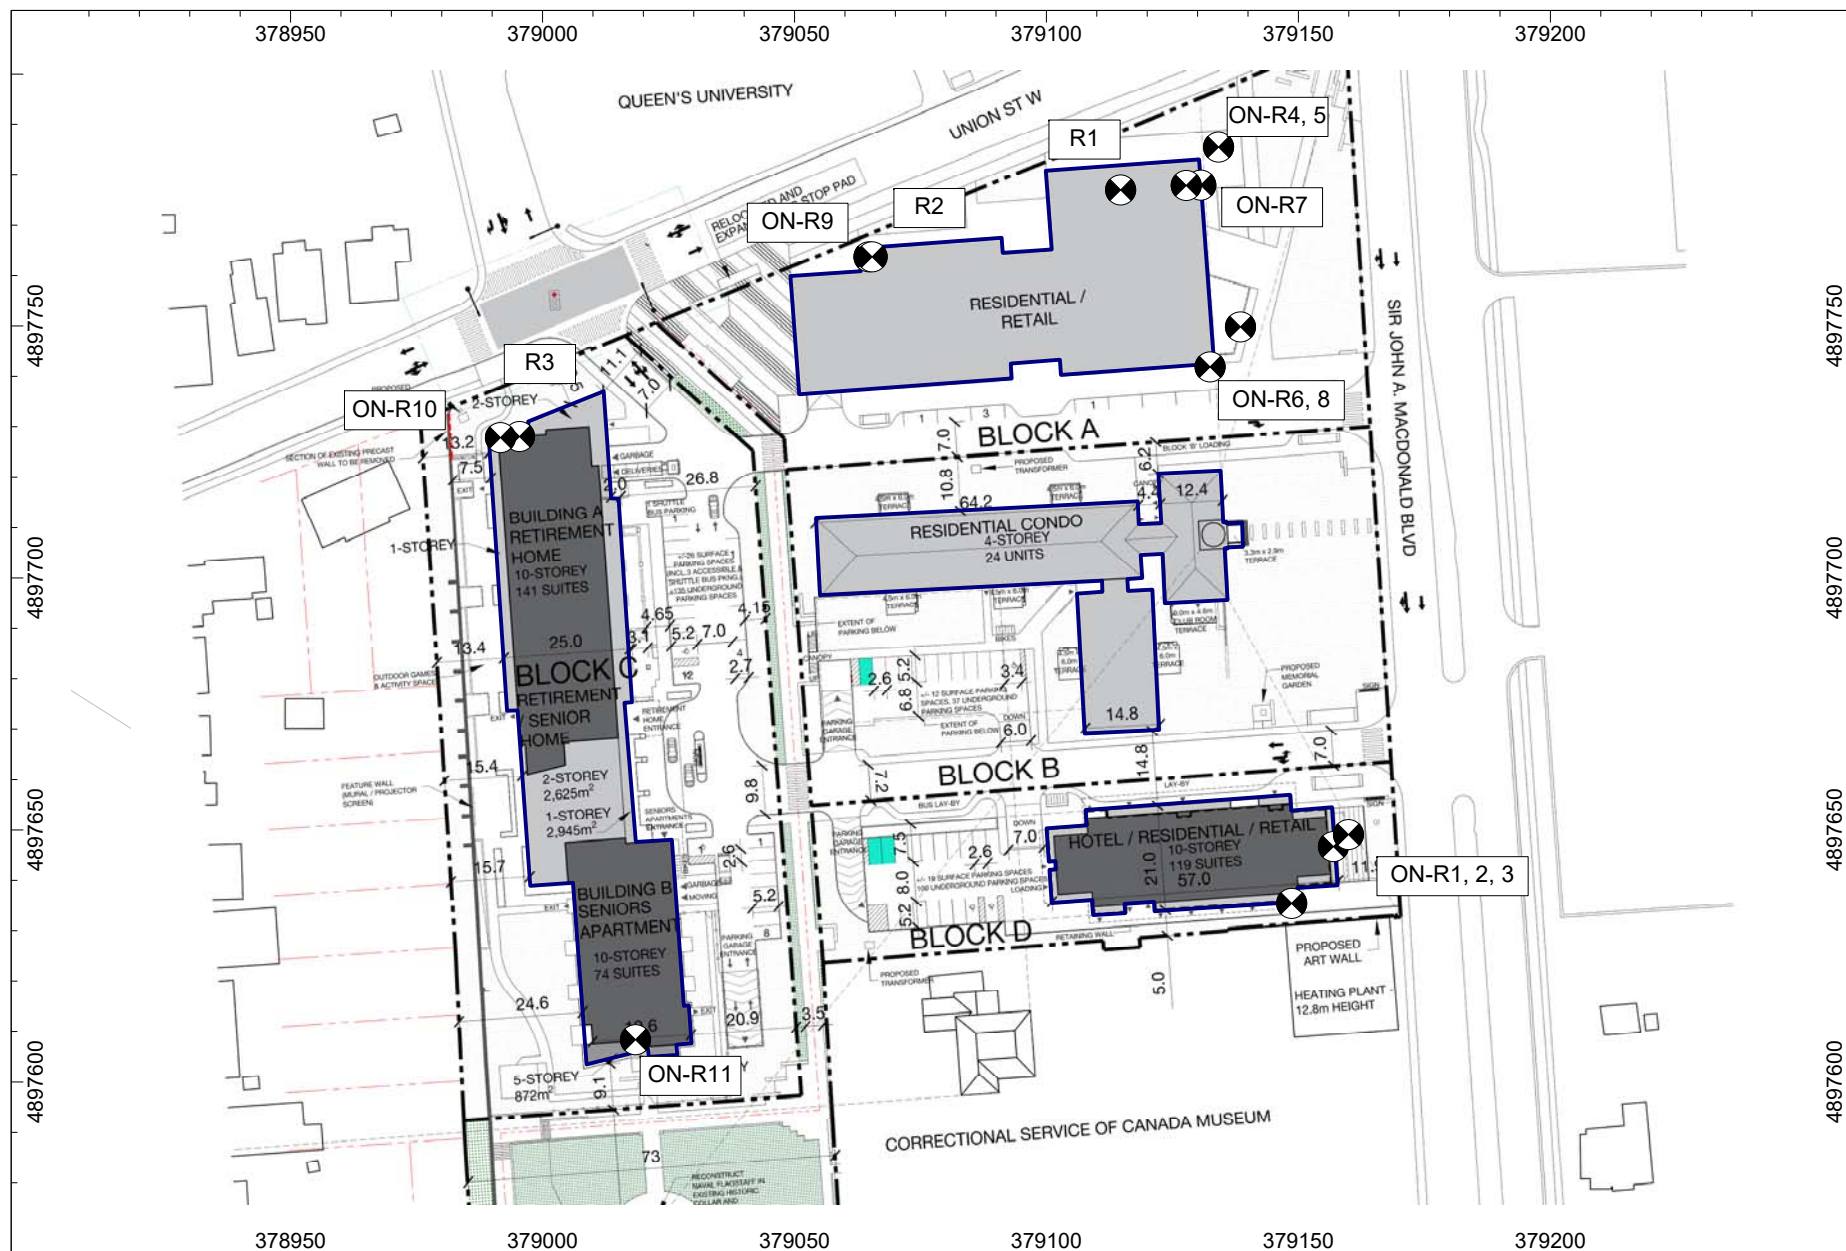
Site Plan, Showing the Proposed Buildings and On-site Receptors
